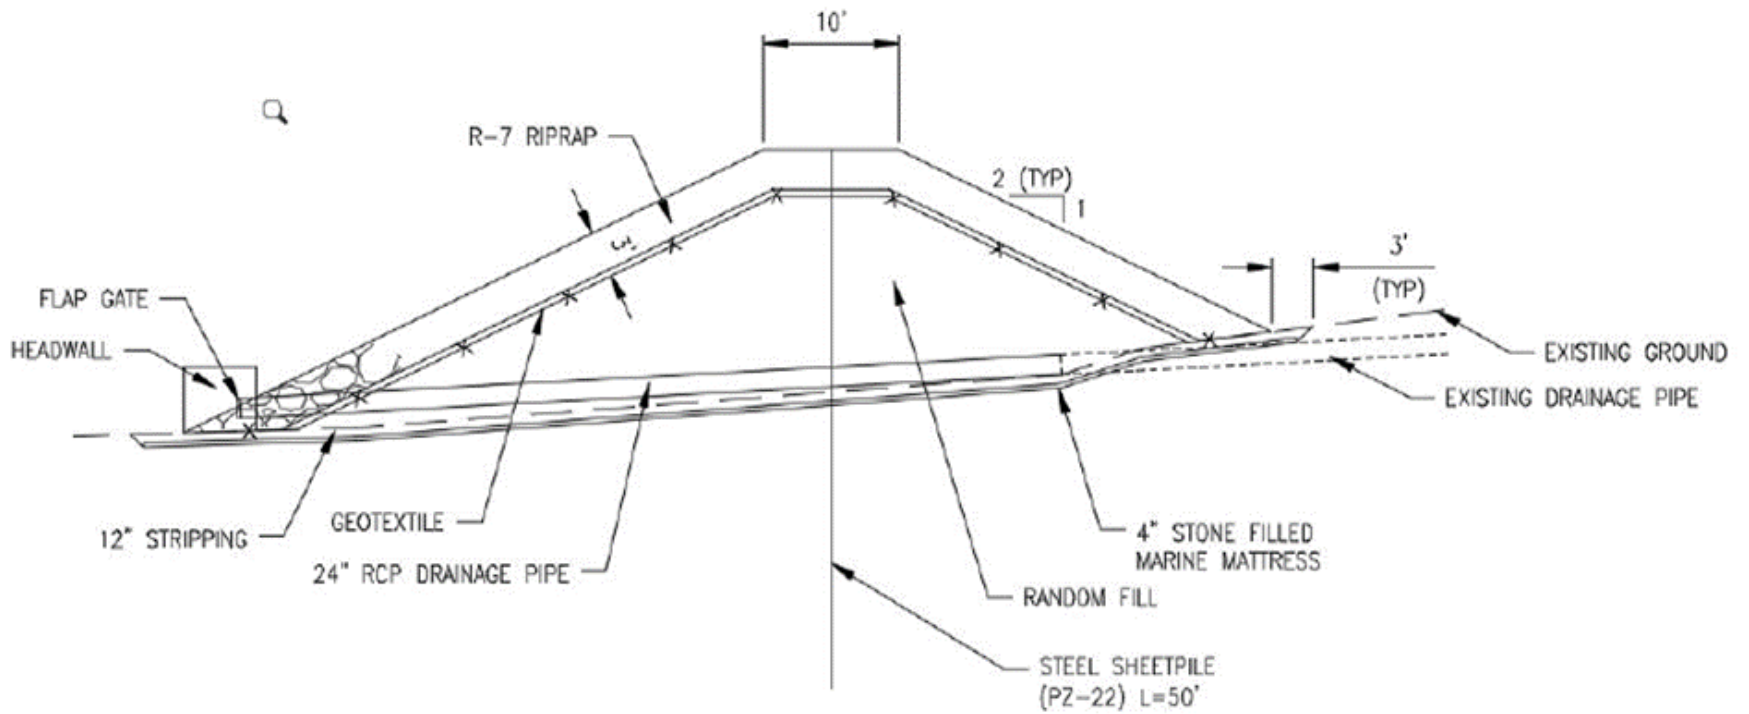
Typical Section of Levee "Type A" Perimeter (Perimeter Plans)
